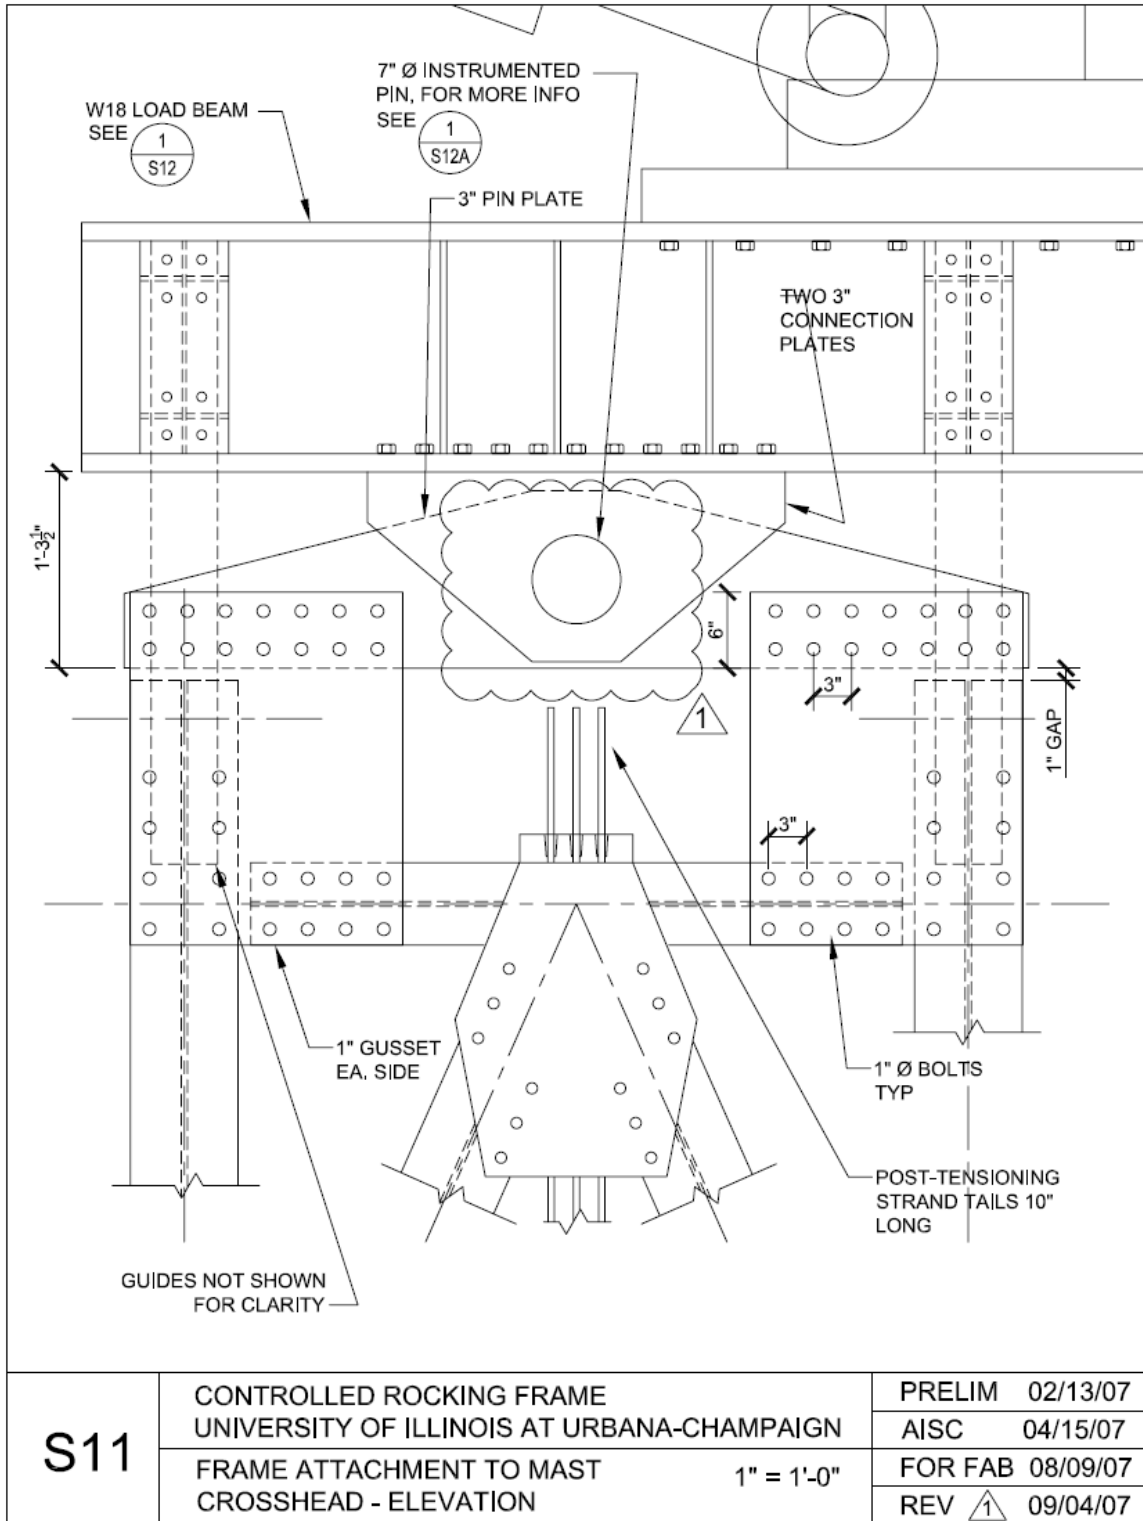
Specimen Design Drawing – Frame Attachment at Top
